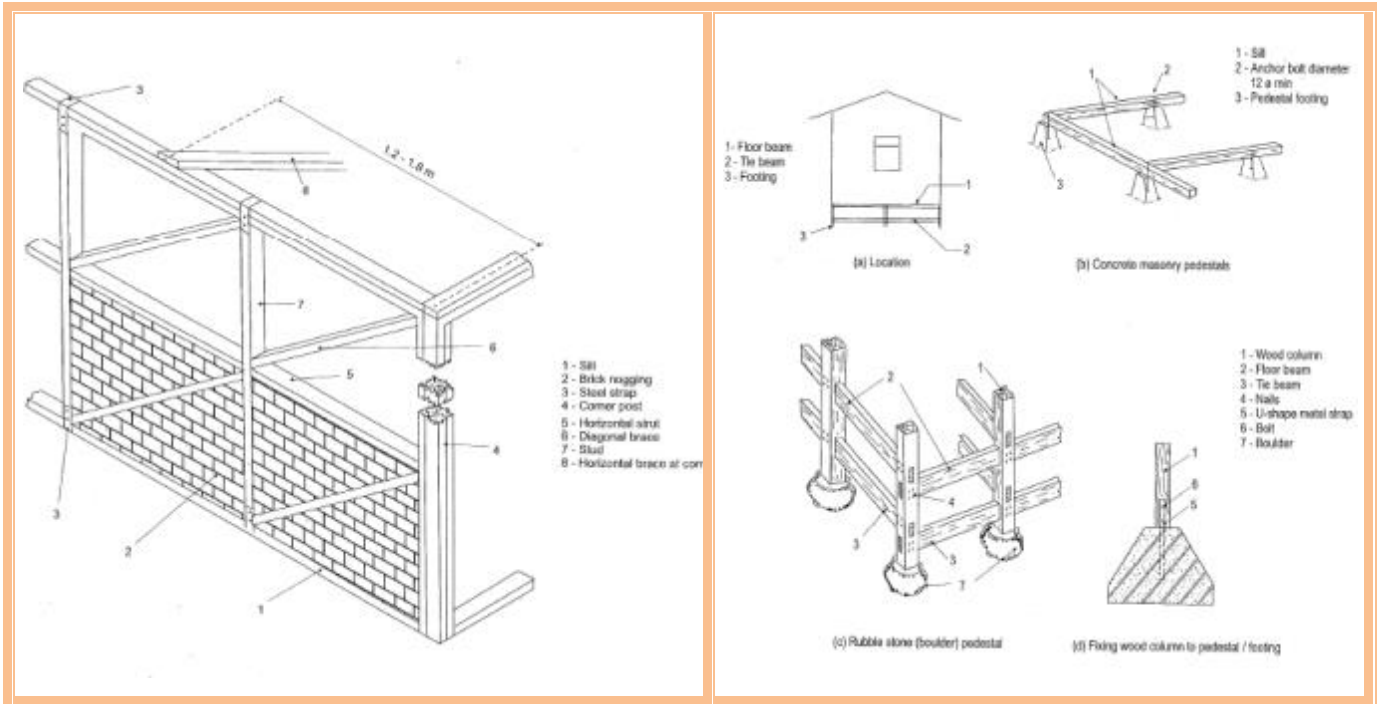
detailed of timber wall(bearing walls) and foundation details(Rush, 2007)
